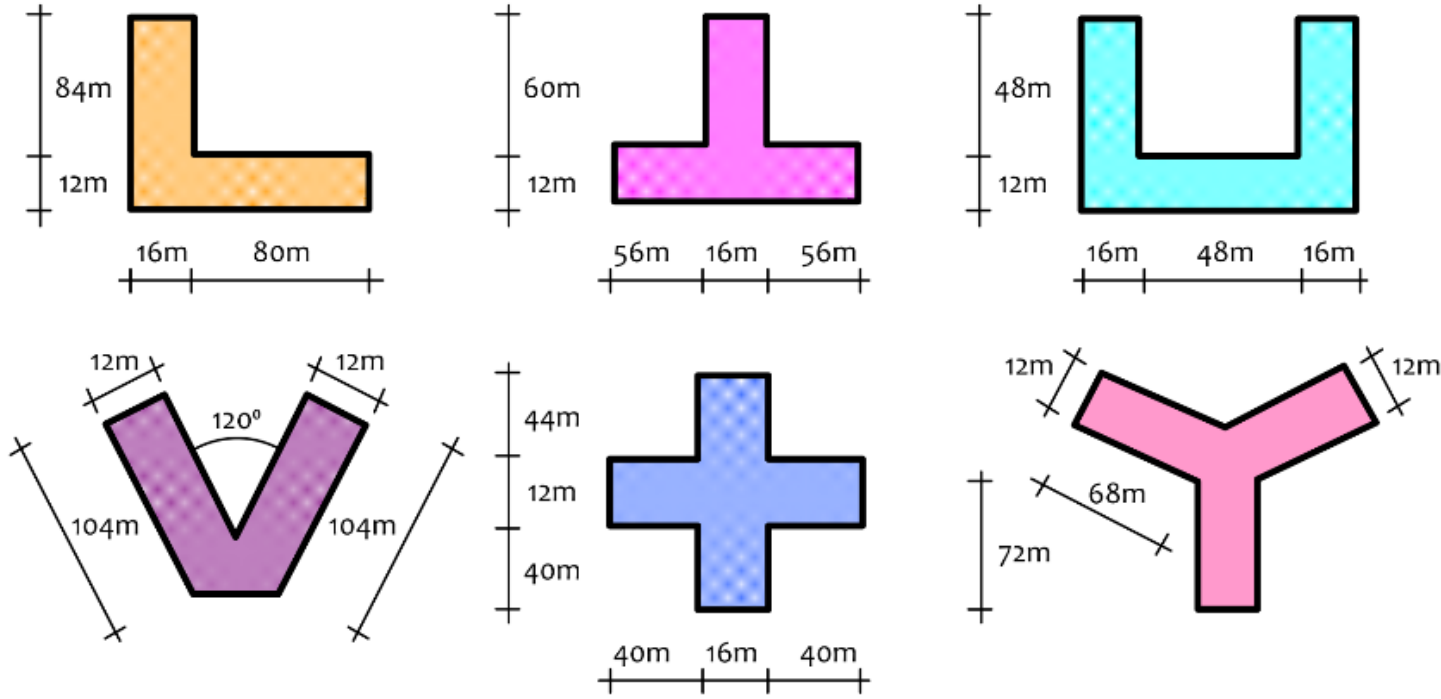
Buildings of different plan shapes: These buildings have approximately the same plan area
